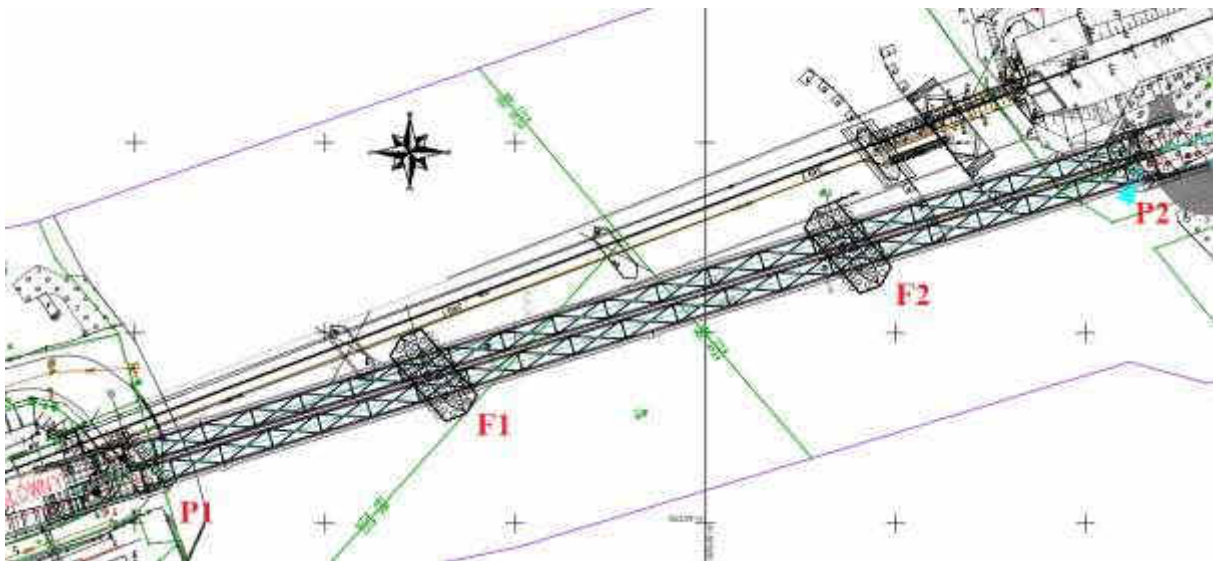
Drawing of a new bridge supports (pillars and bridgeheads)
